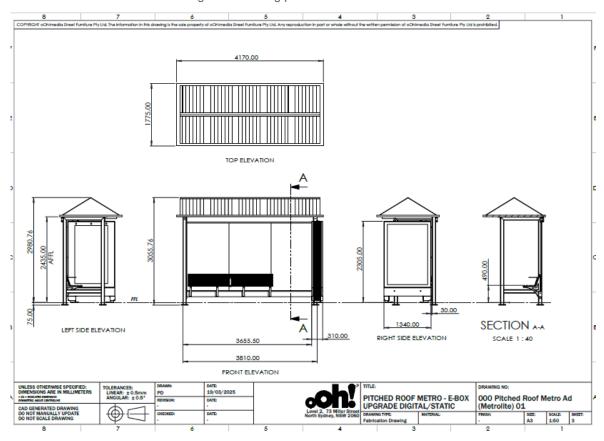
Proposed Digital/Static Signage Elevation – Pitched Roof Metro
